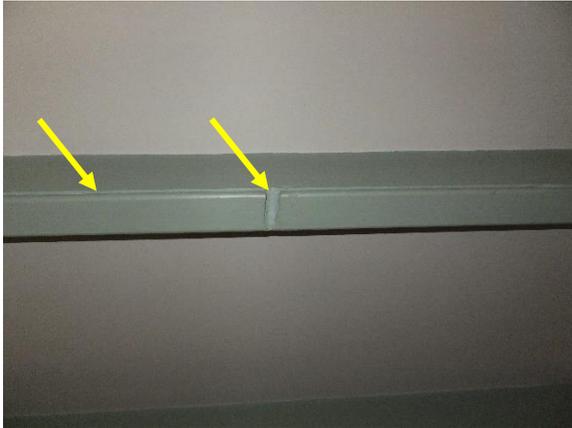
Joists running east to west with bead finish. Note loss of knot.
